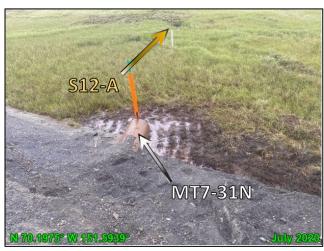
Culvert MT7-31 after soughed gravel replaced on embankment; July, 2020
